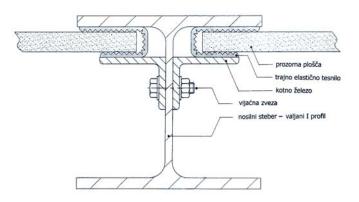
Method of fastening of single-layer noise protection element/plate to the supporting pillar
